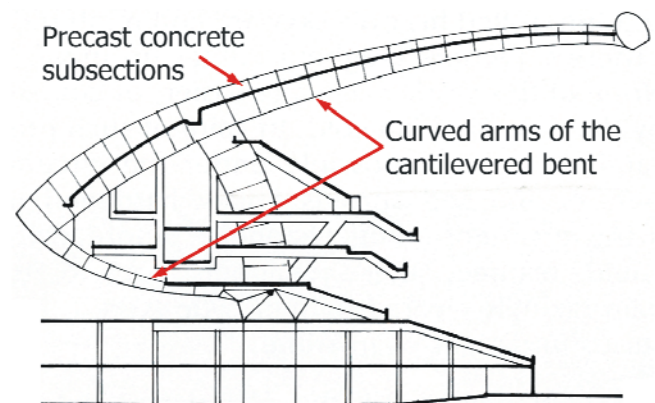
Precast concrete subsections were assembled on site to create 34 massive supports, called "bents."
